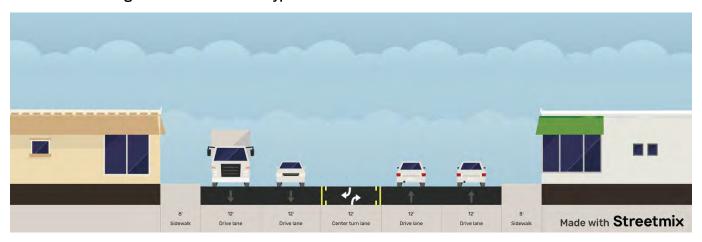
Grand Avenue Typical Section 3: 23rd Street to 13th Street
